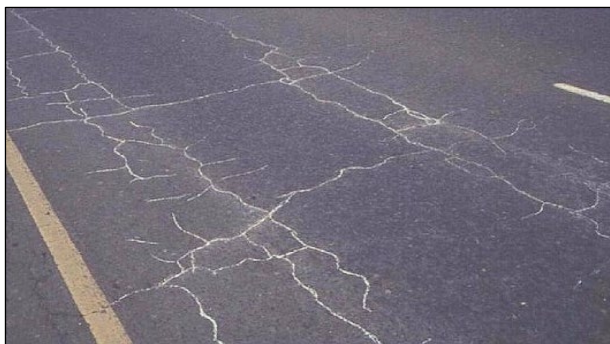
Block cracking on an FDR-C pavement (note pumping of fines through cracks).
